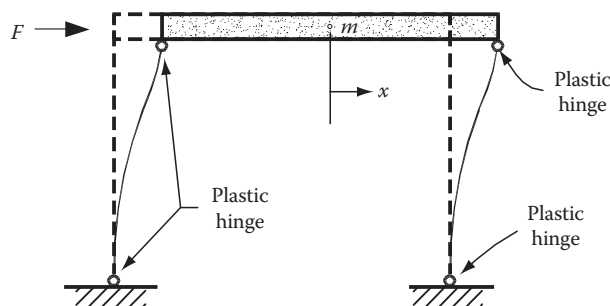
Idealized steel portal frame subject to load P at top.
